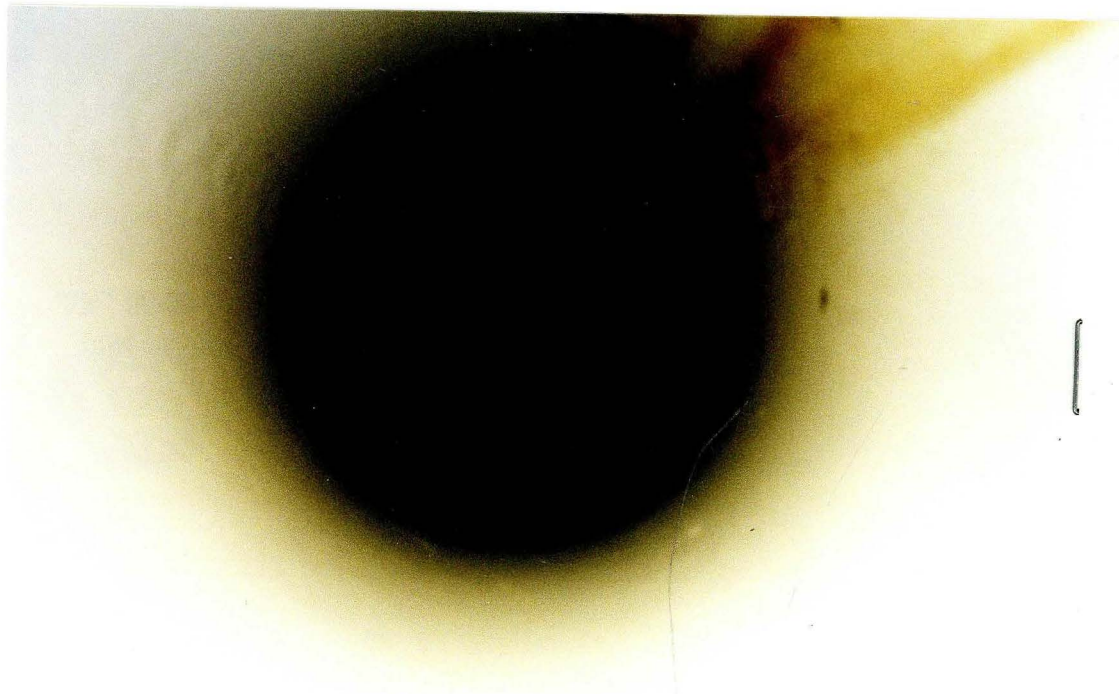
View looking down valve pipe stack found in the area between the "plastic" and "natural" pond.
